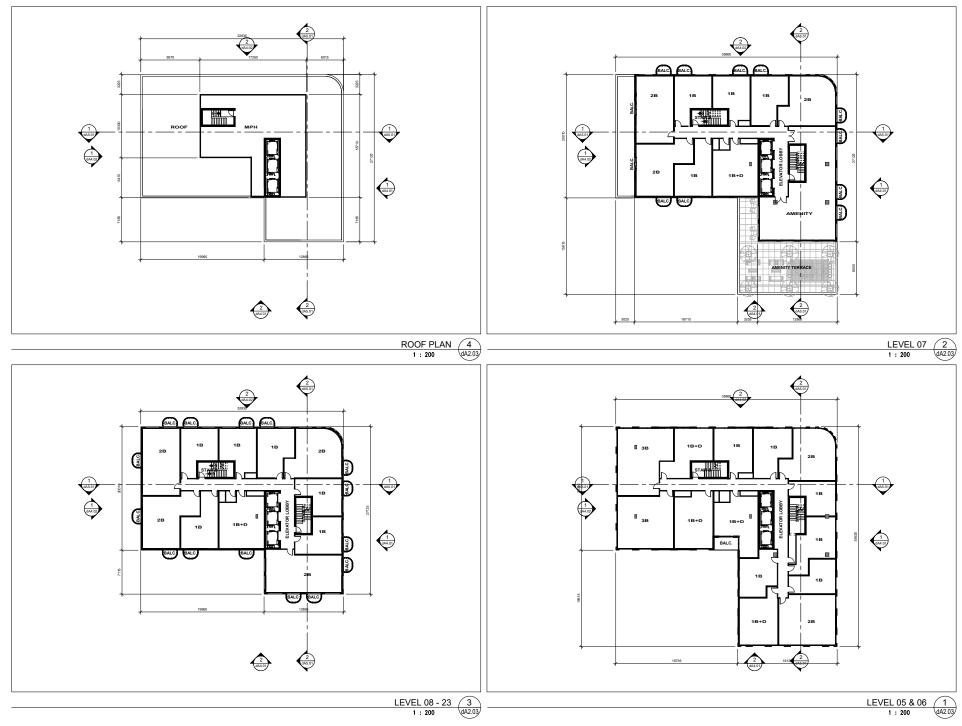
Floor Plans prepared by Kirkor Architects and Planners
